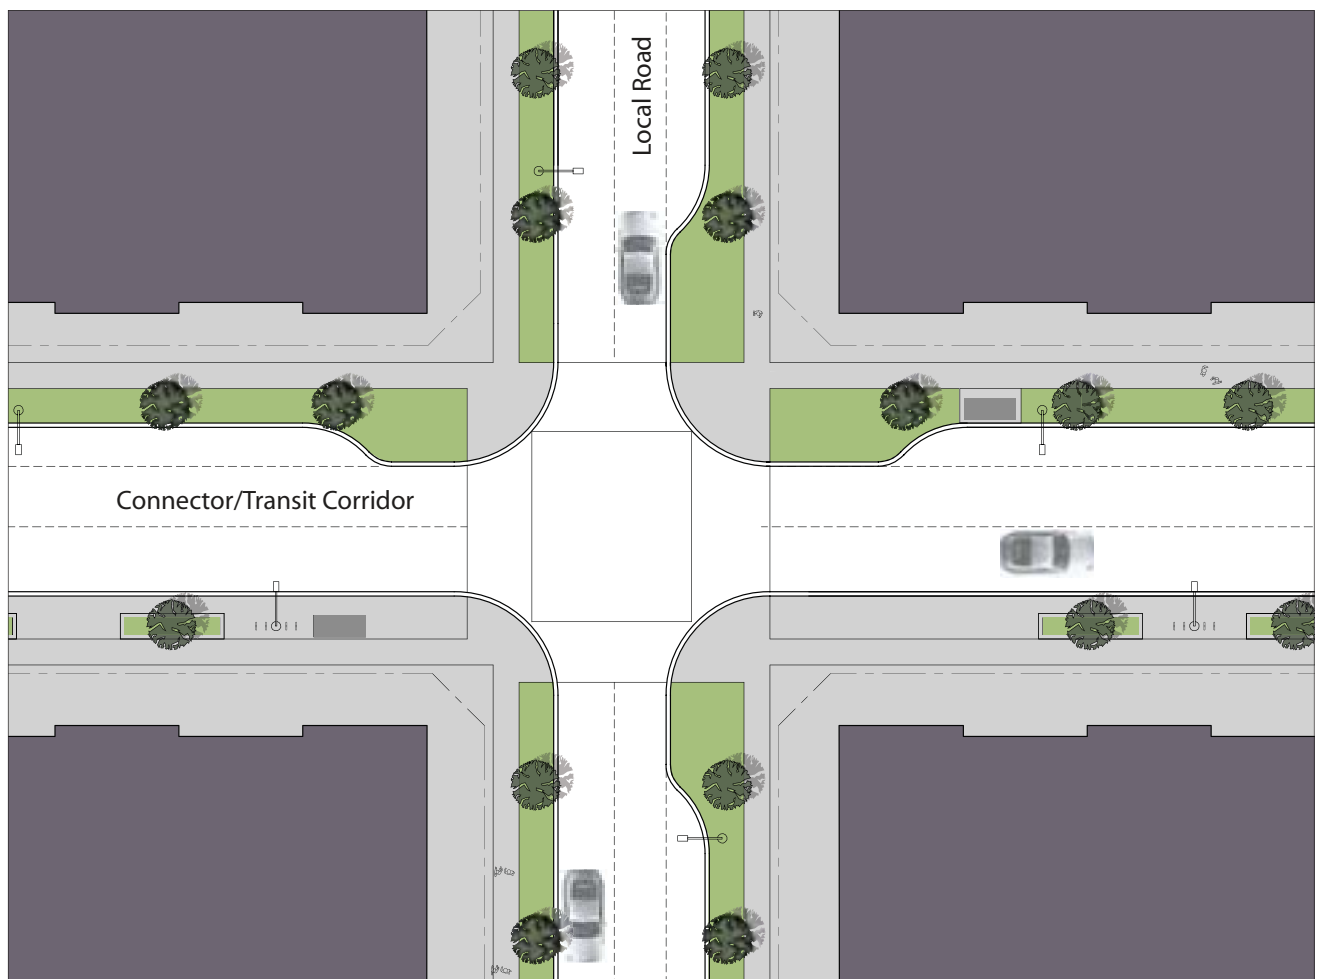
Typical intersection plan through the Neighbourhood Centre.
